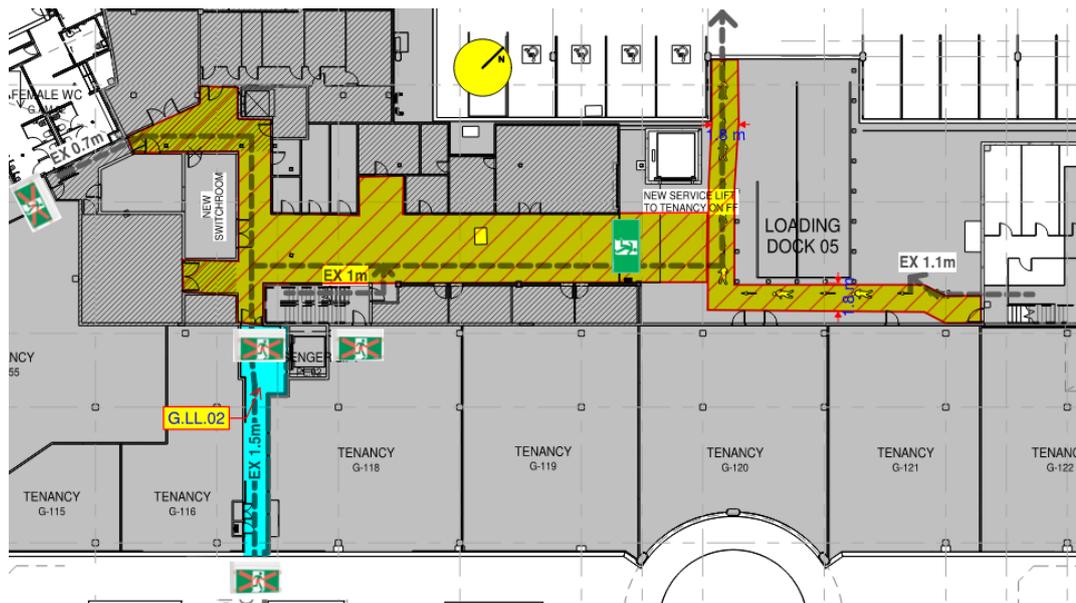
Floor markings for occupant egress through BoH and Loading Dock 05
